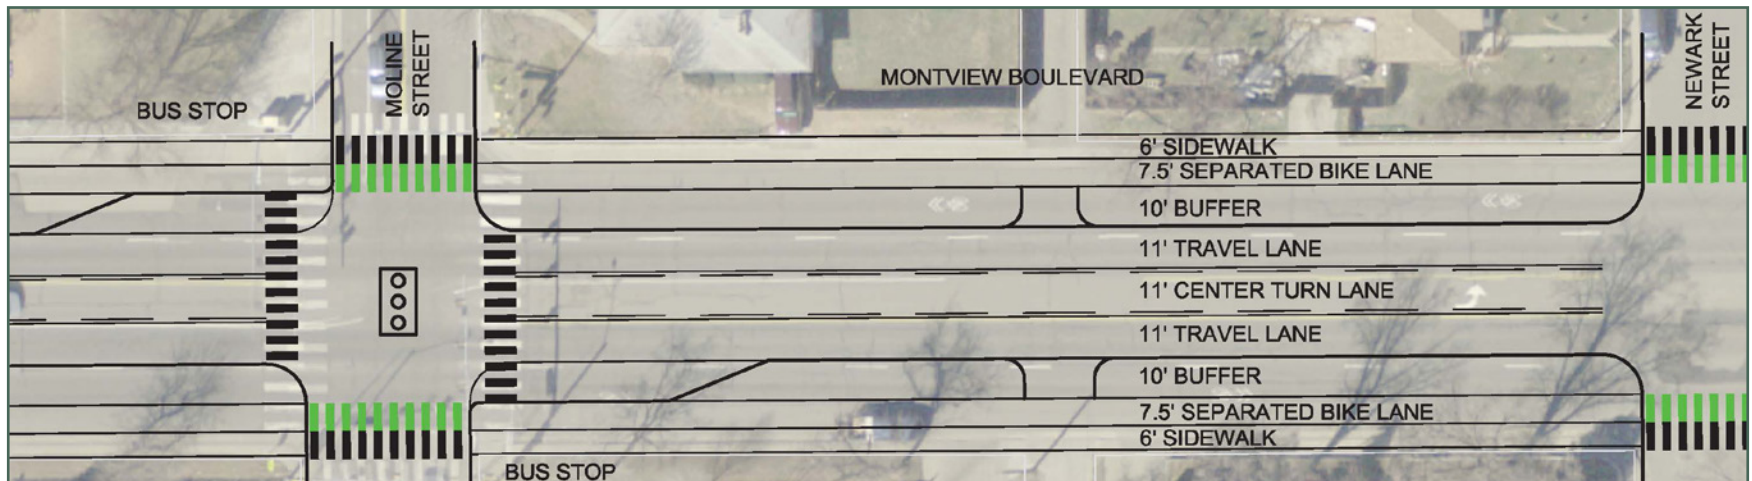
East Residential Zone Road Diet with Separated Bikeway - Plan
